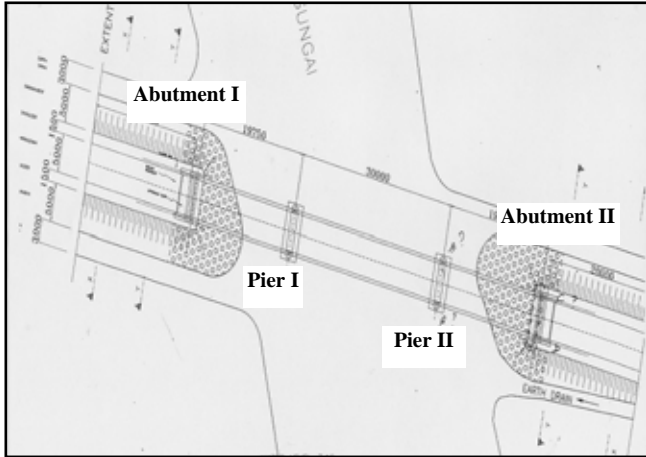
Layout of Piers and Abutments (After Gue & Tan, 2003)
